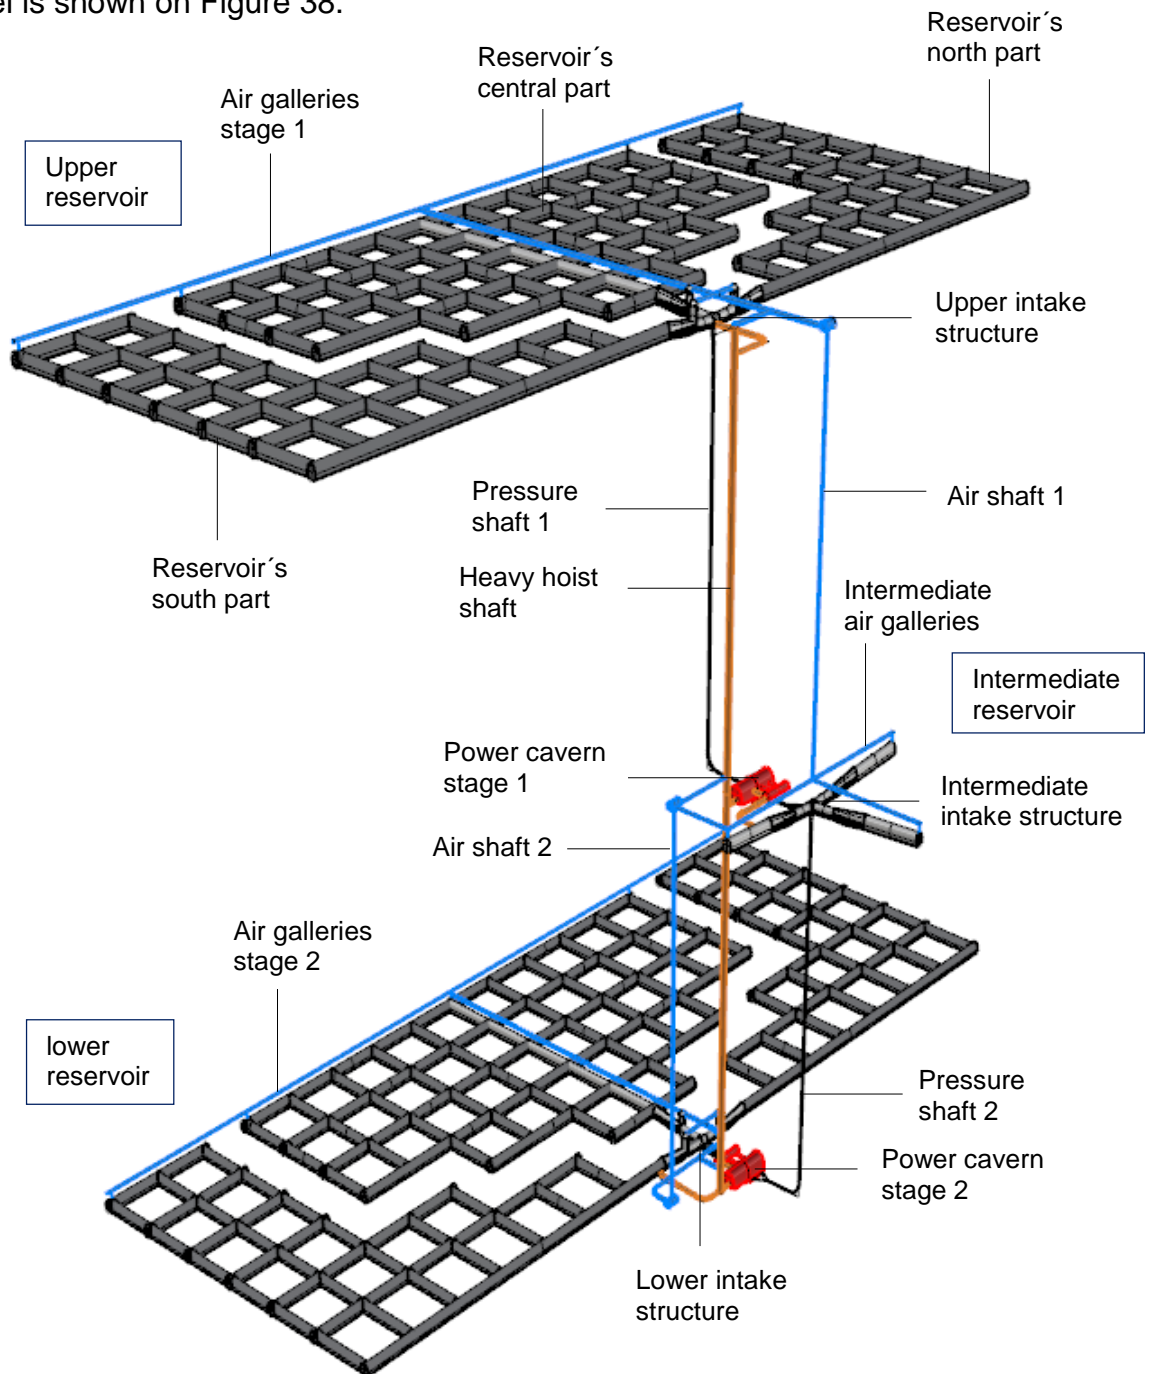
3D Model of the entire Underground Pumped Storage Hydro system
